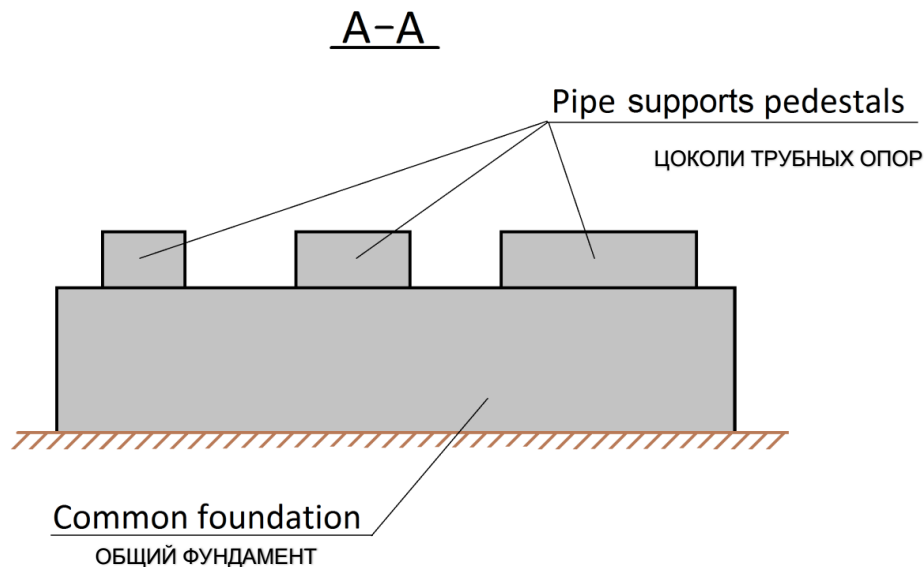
Pipe supports grouped foundation elevation (A-A section)
